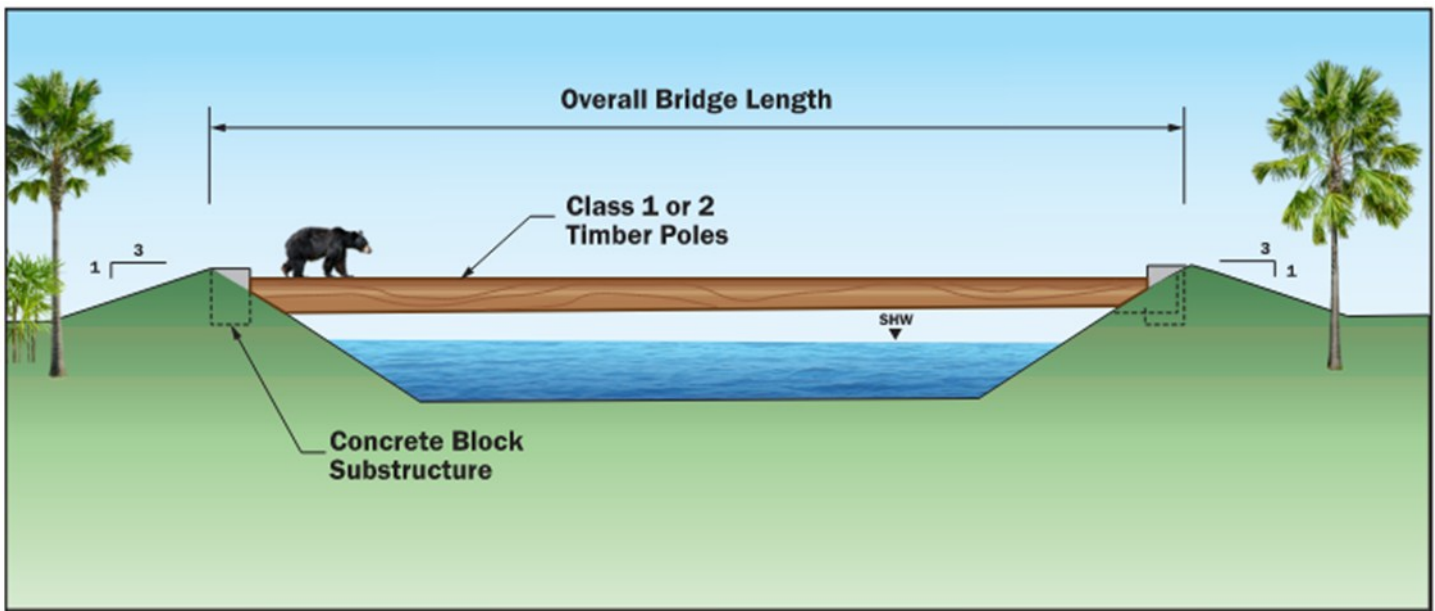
Concept of a timber pile bridge canal crossing with end blocks for substructure.
